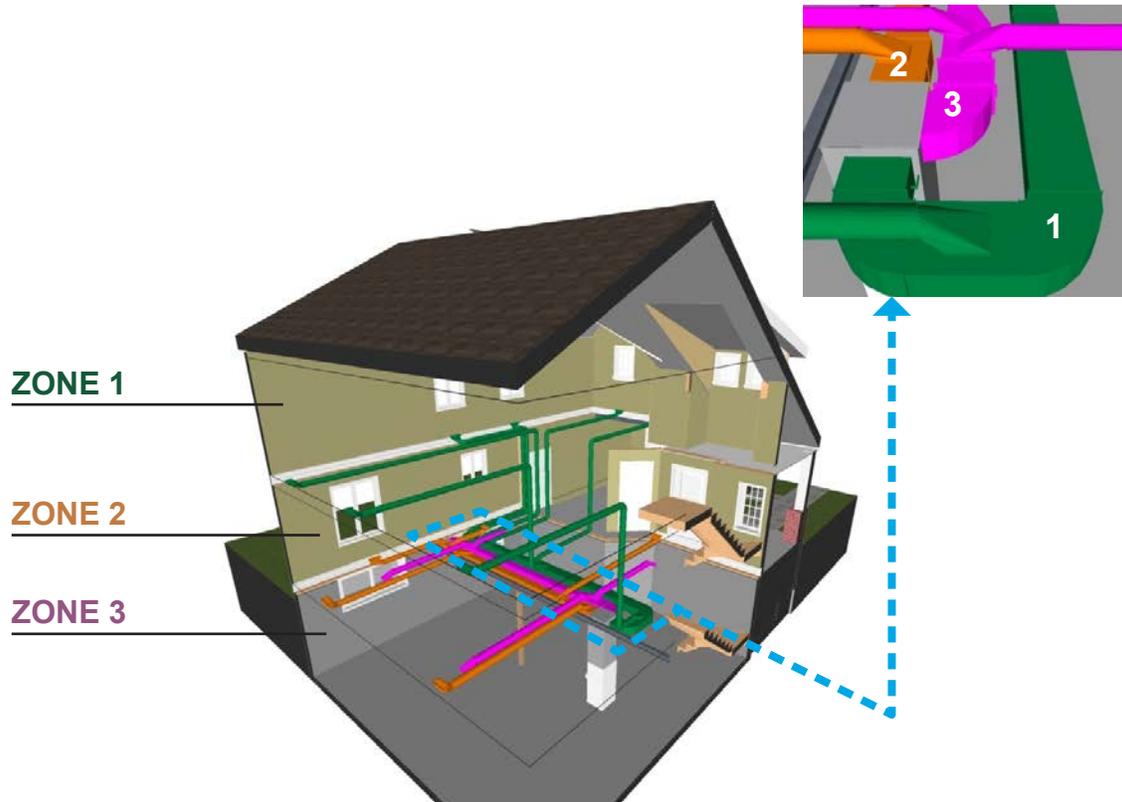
Floor-by-floor Zoned Ducting using OPTION A: Traditional Supply Ducts
